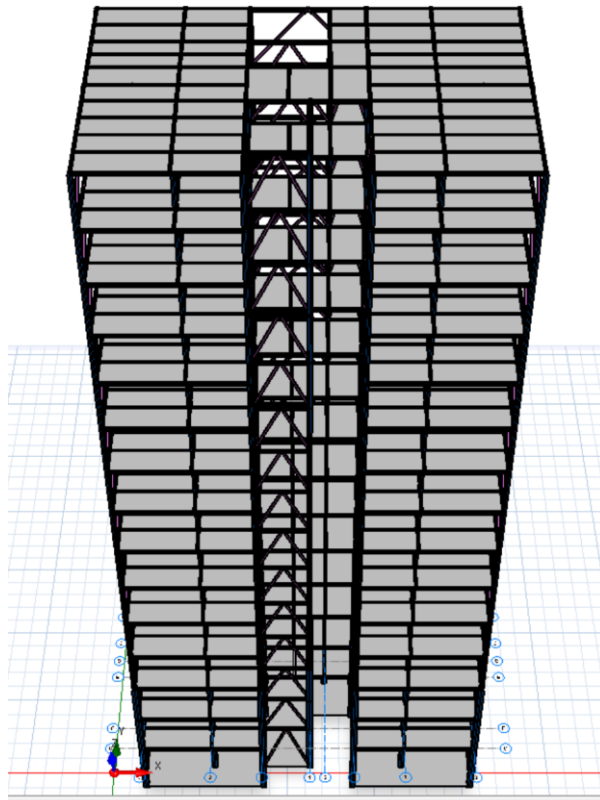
SS14 Model (Steel Model – 14 Floors with 1 Basement)
